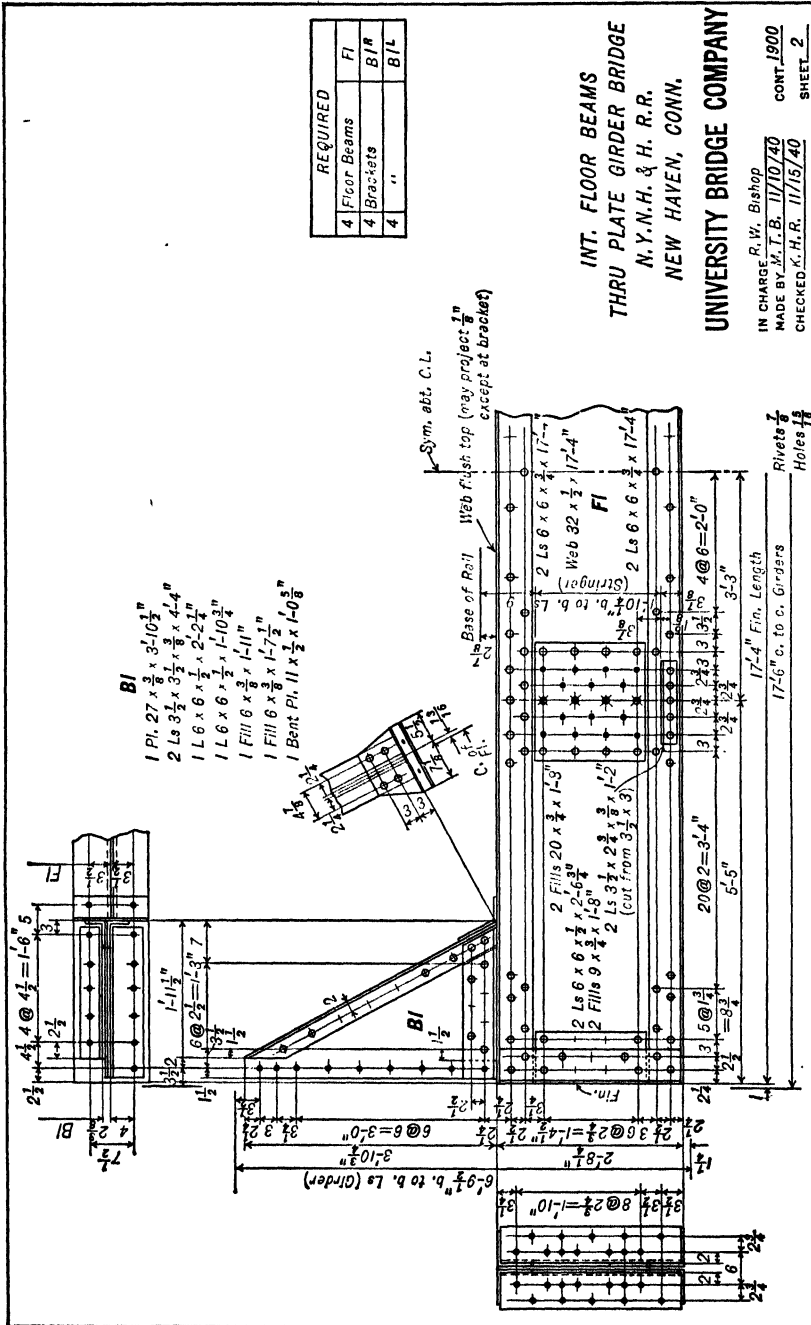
Floor Beams for Through Girder Railroad Bridge.
